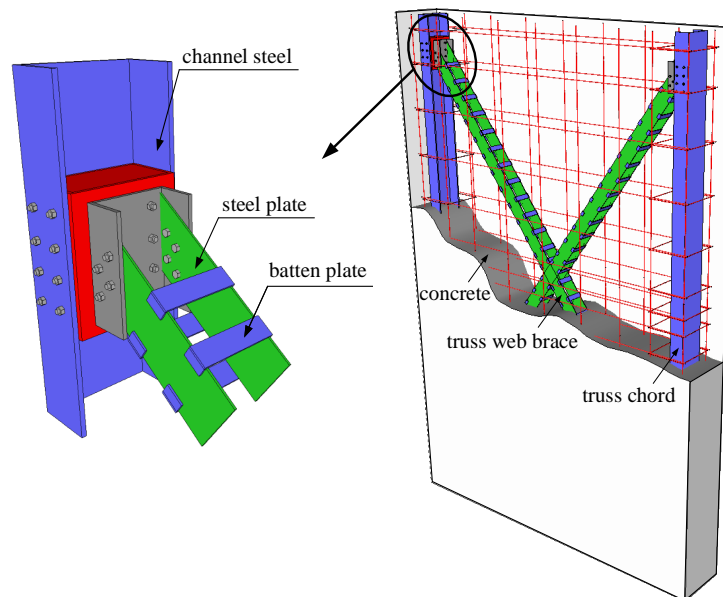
Proposed details for composite walls with encased CFTW steel truss
